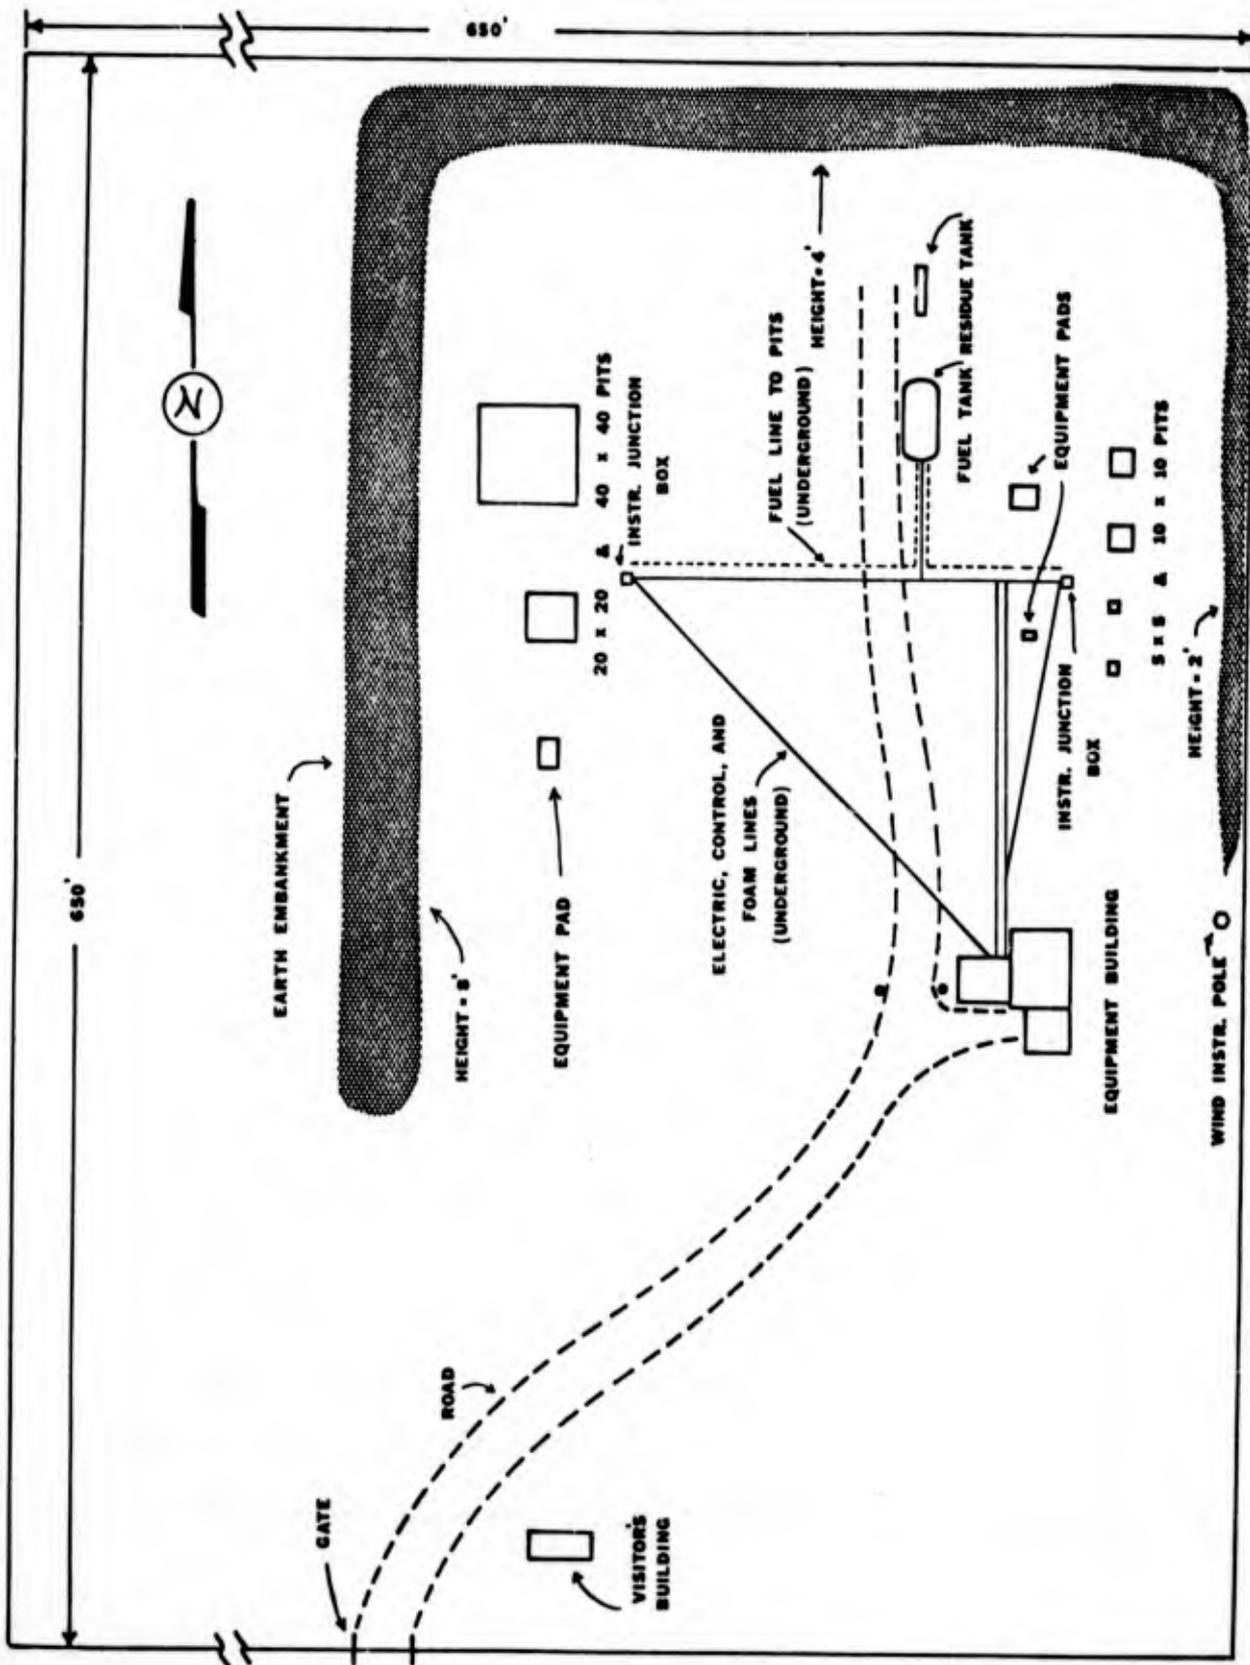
FIRE TEST FACILITY LAYOUT.
